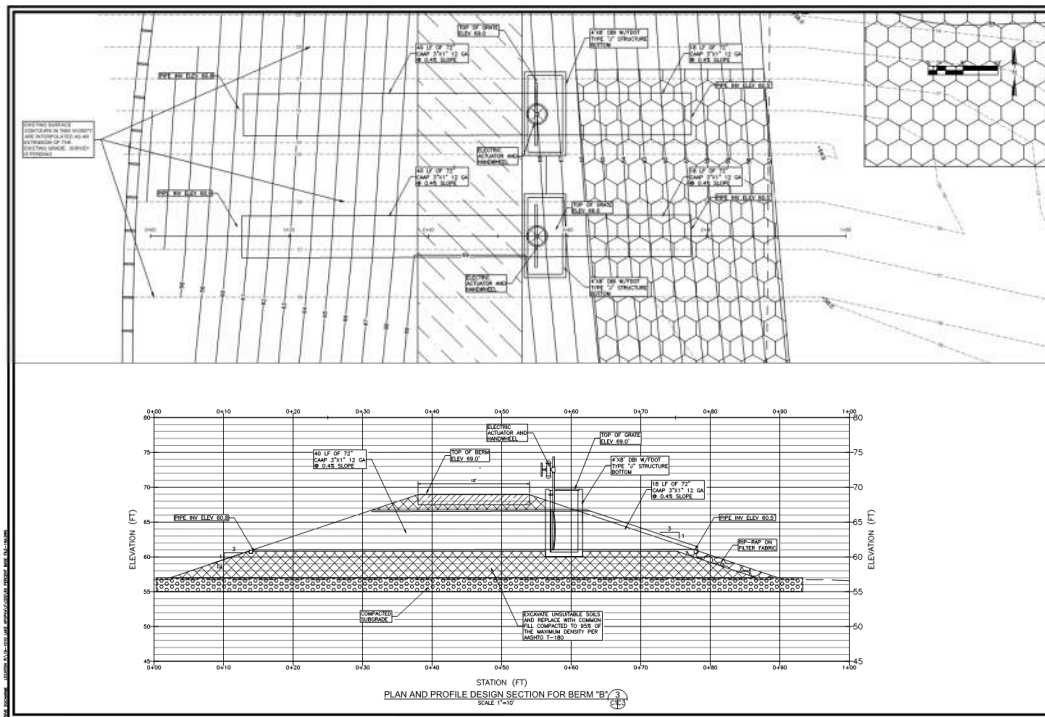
Proposed Plan & Profile Design Section – South Berm
